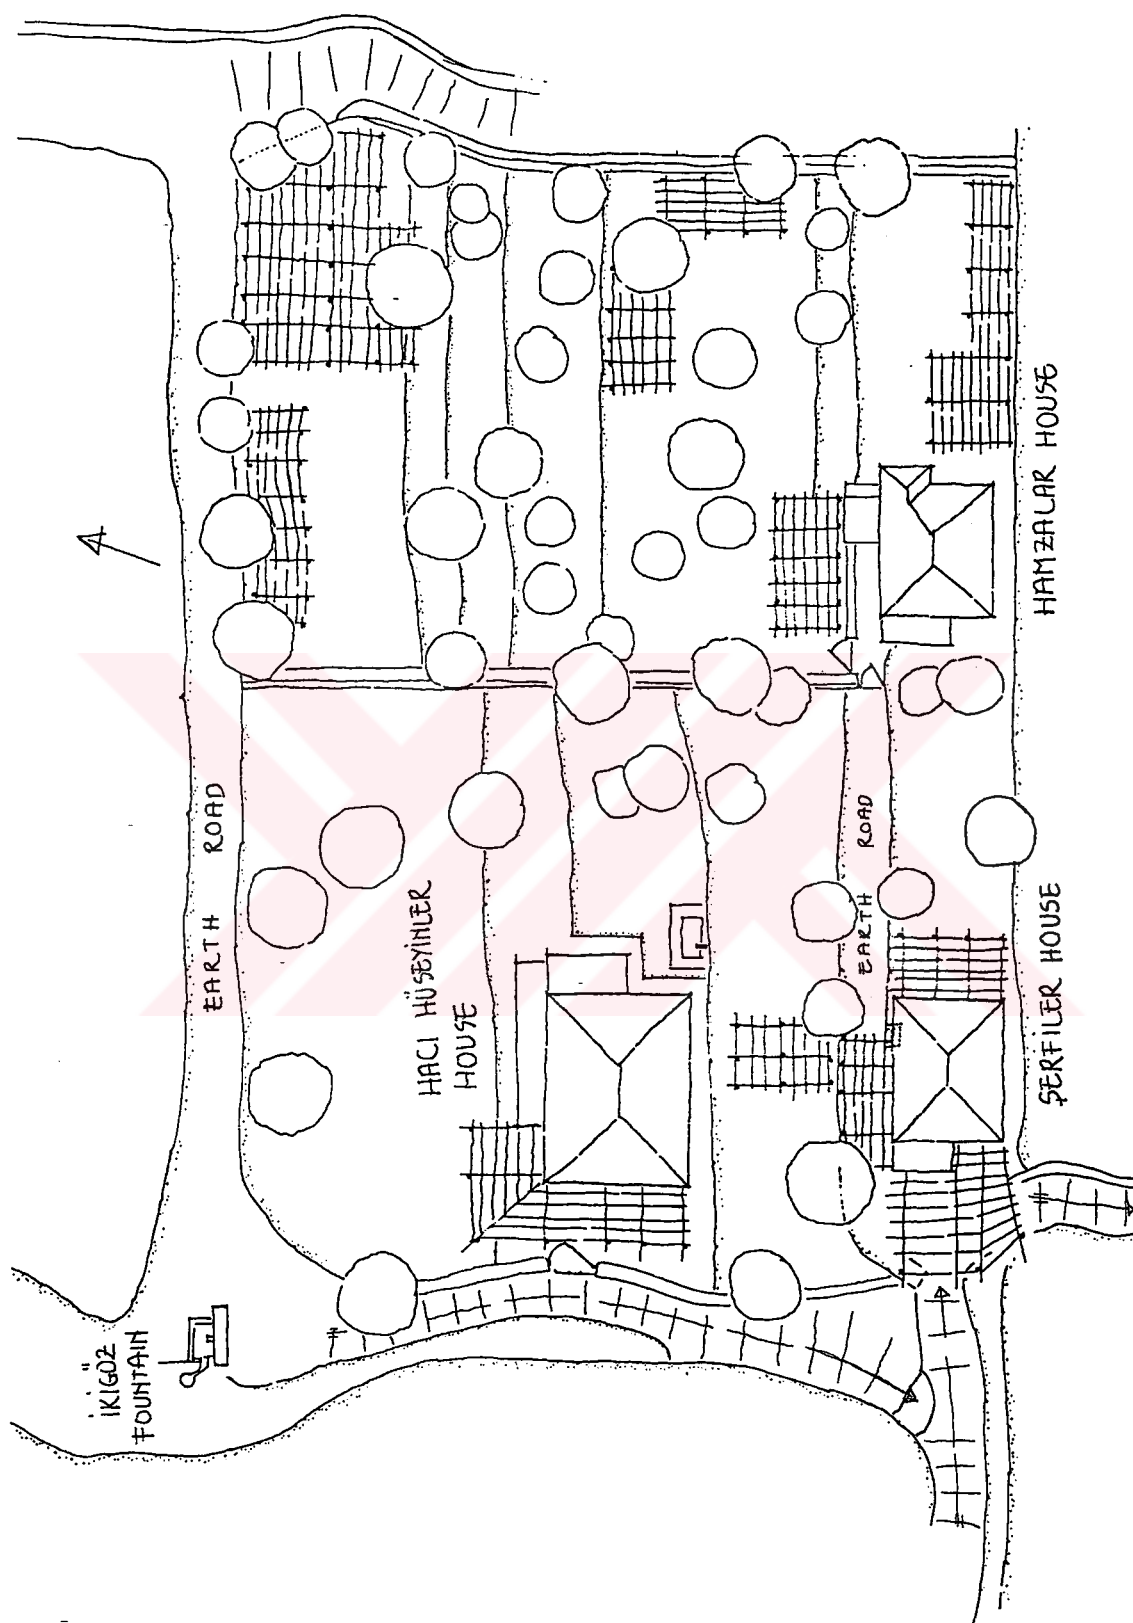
Schematic site plan of Hacı Hüseyinler House-not to scale.
